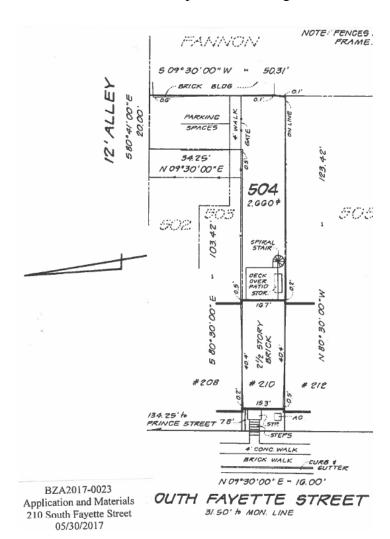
Plat showing existing conditions of 210 South Fayette Street
